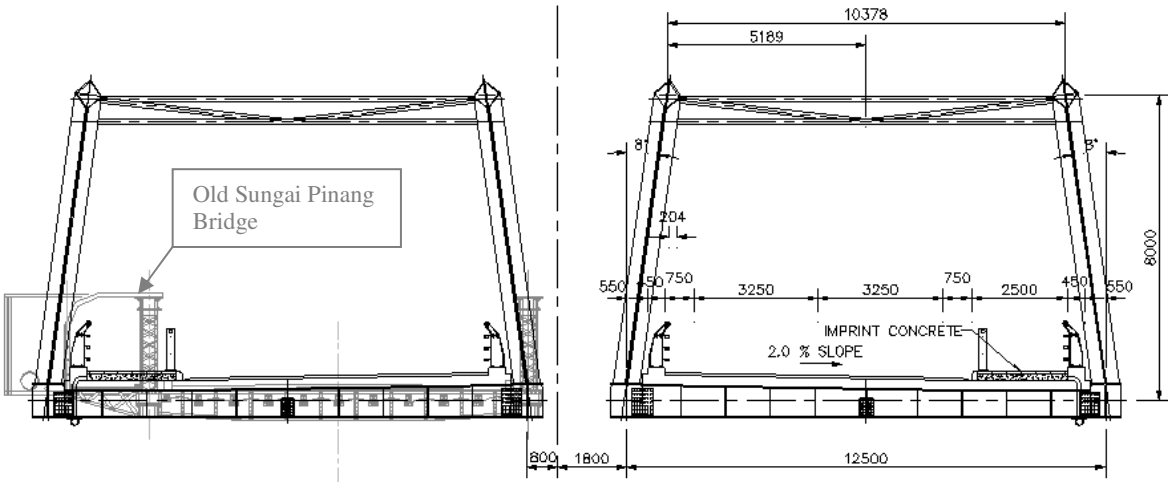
Cross section of the old and new Sungai Pinang Bridge
